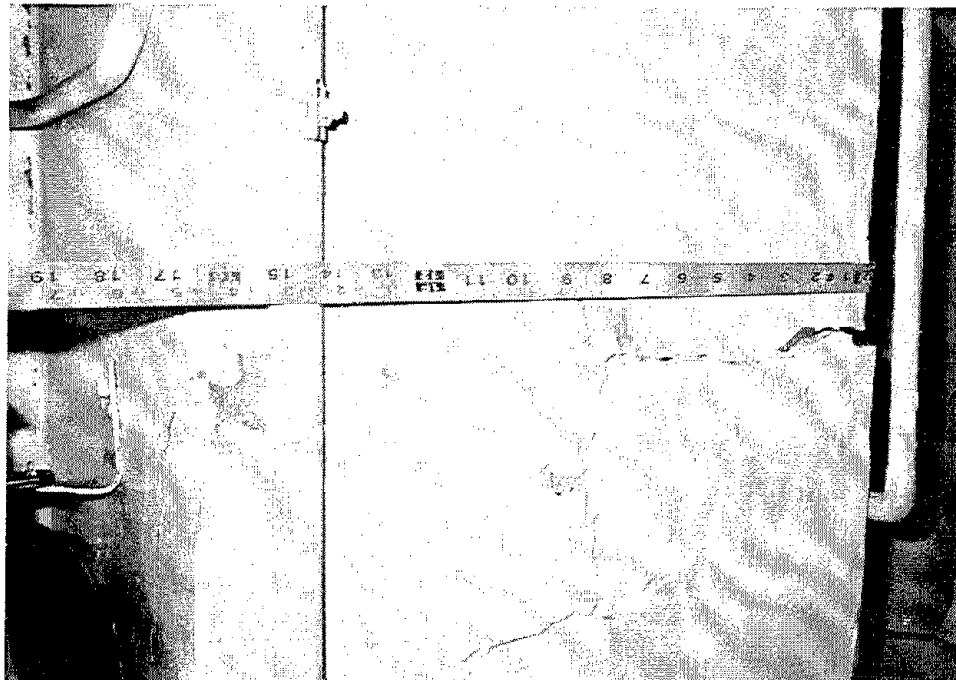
VA Hospital Bldg. #40. Same interior column as Figure 15.19 along north wall. Concrete spalled at 6 inch lap splice.
